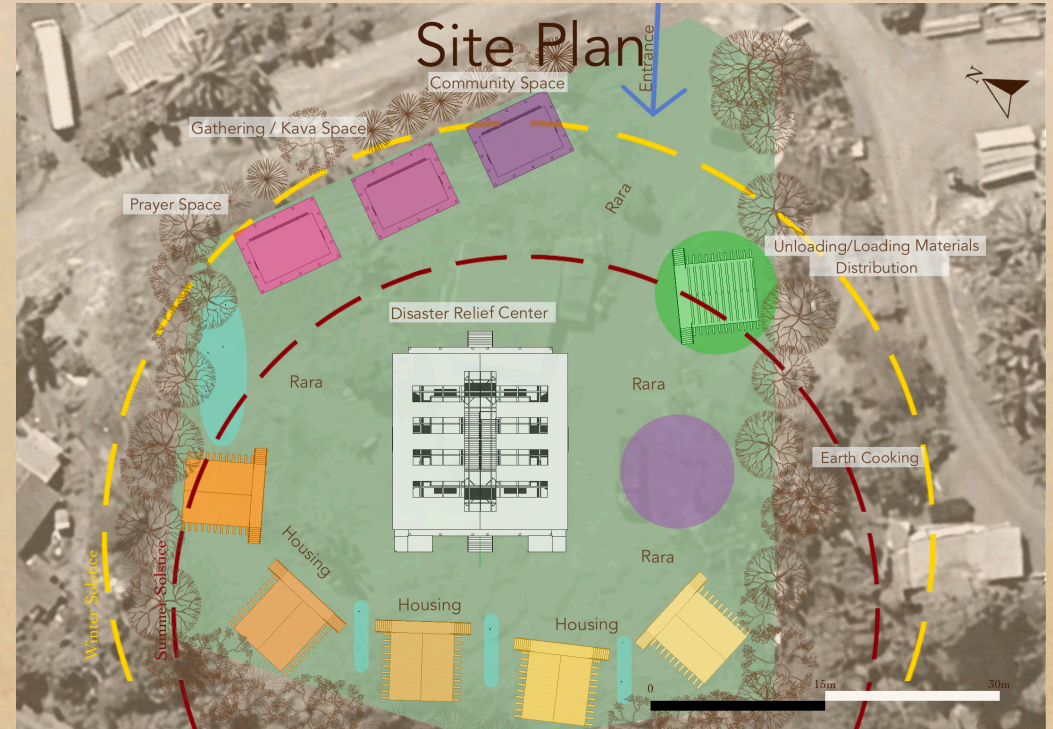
Site plan with allocated areas for building and communication of the site layout and systems (image created by the author).
